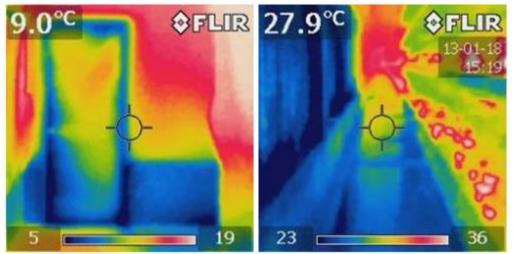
Cold air leaking through the door (left) and cool pad (right)
